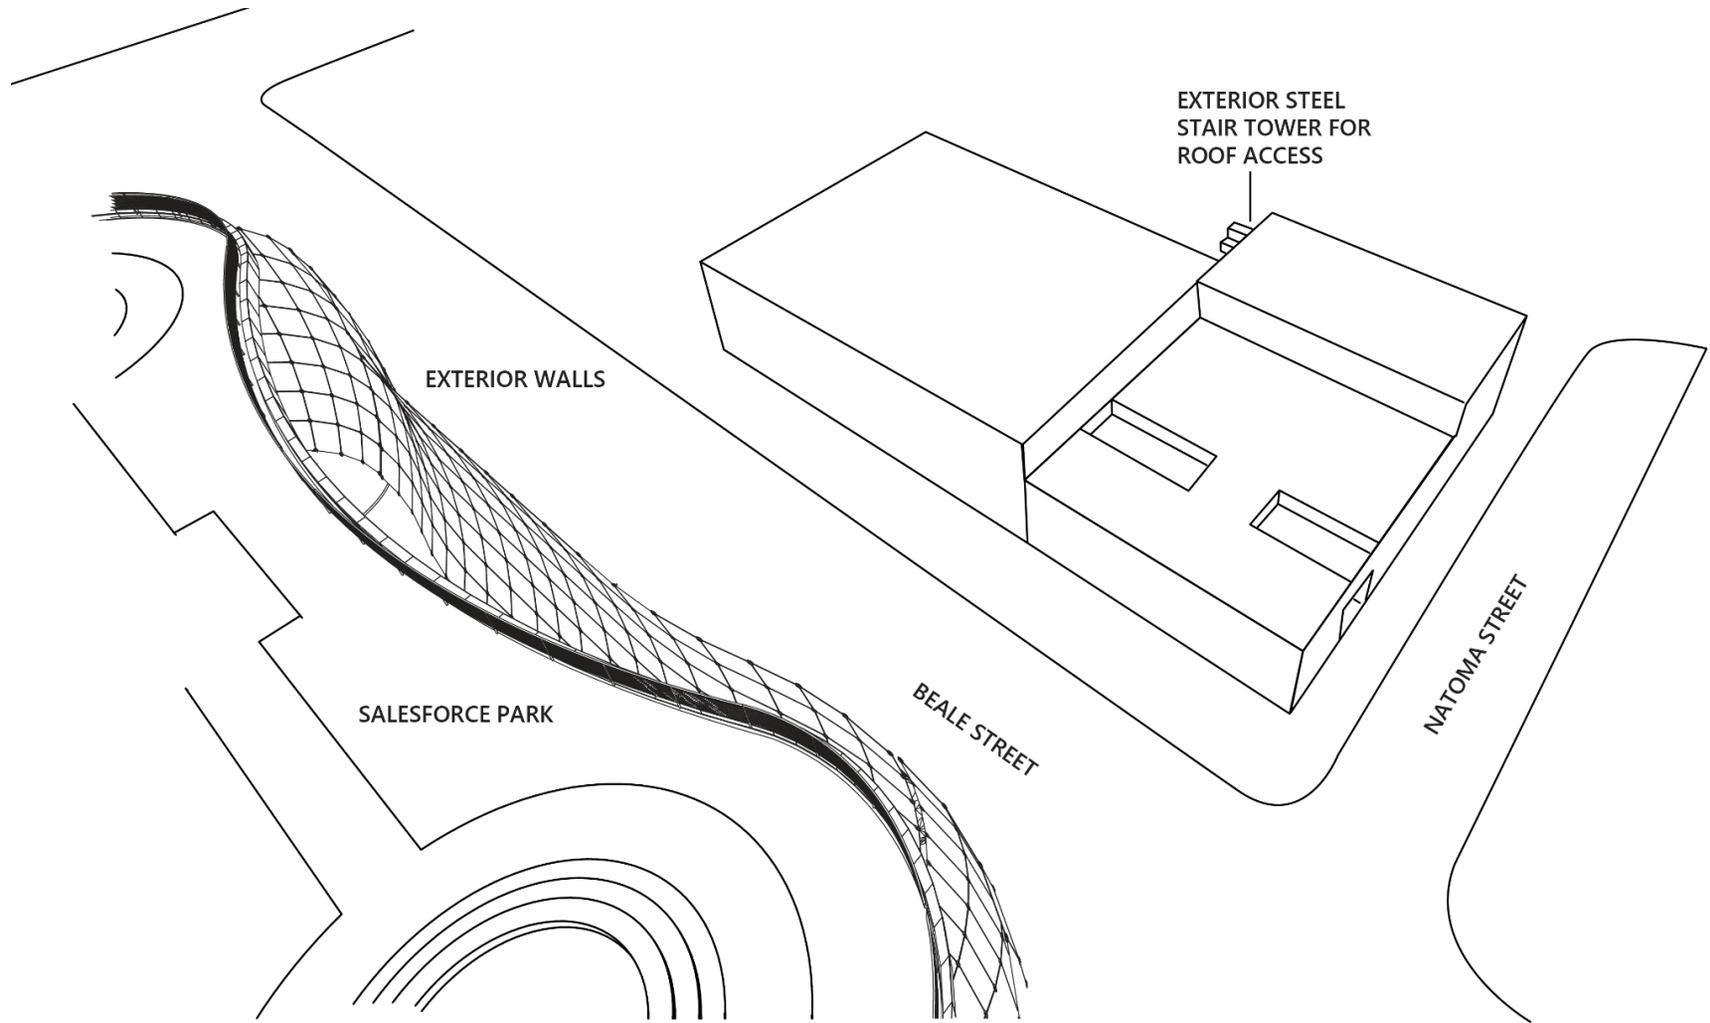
Proposed At-Grade Utility Building Looking Northeast from Salesforce Transit Center
